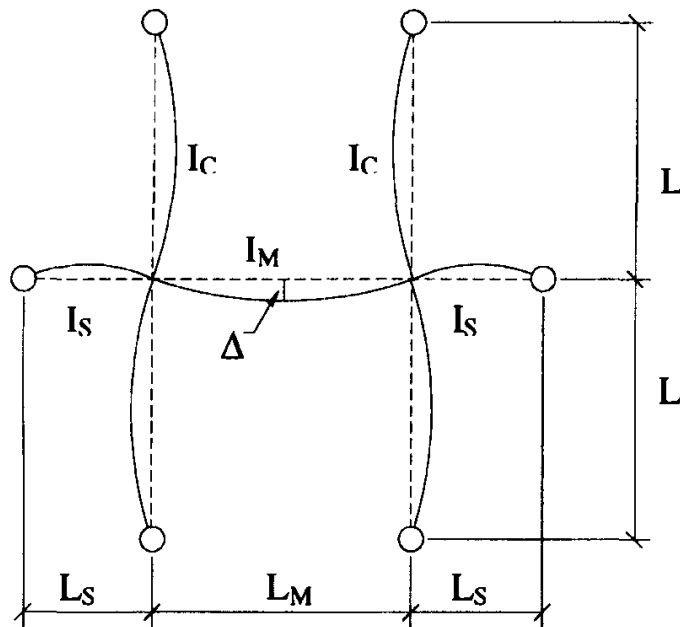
Modal flexural deflections, for beams or girders continuous with columns [5]
